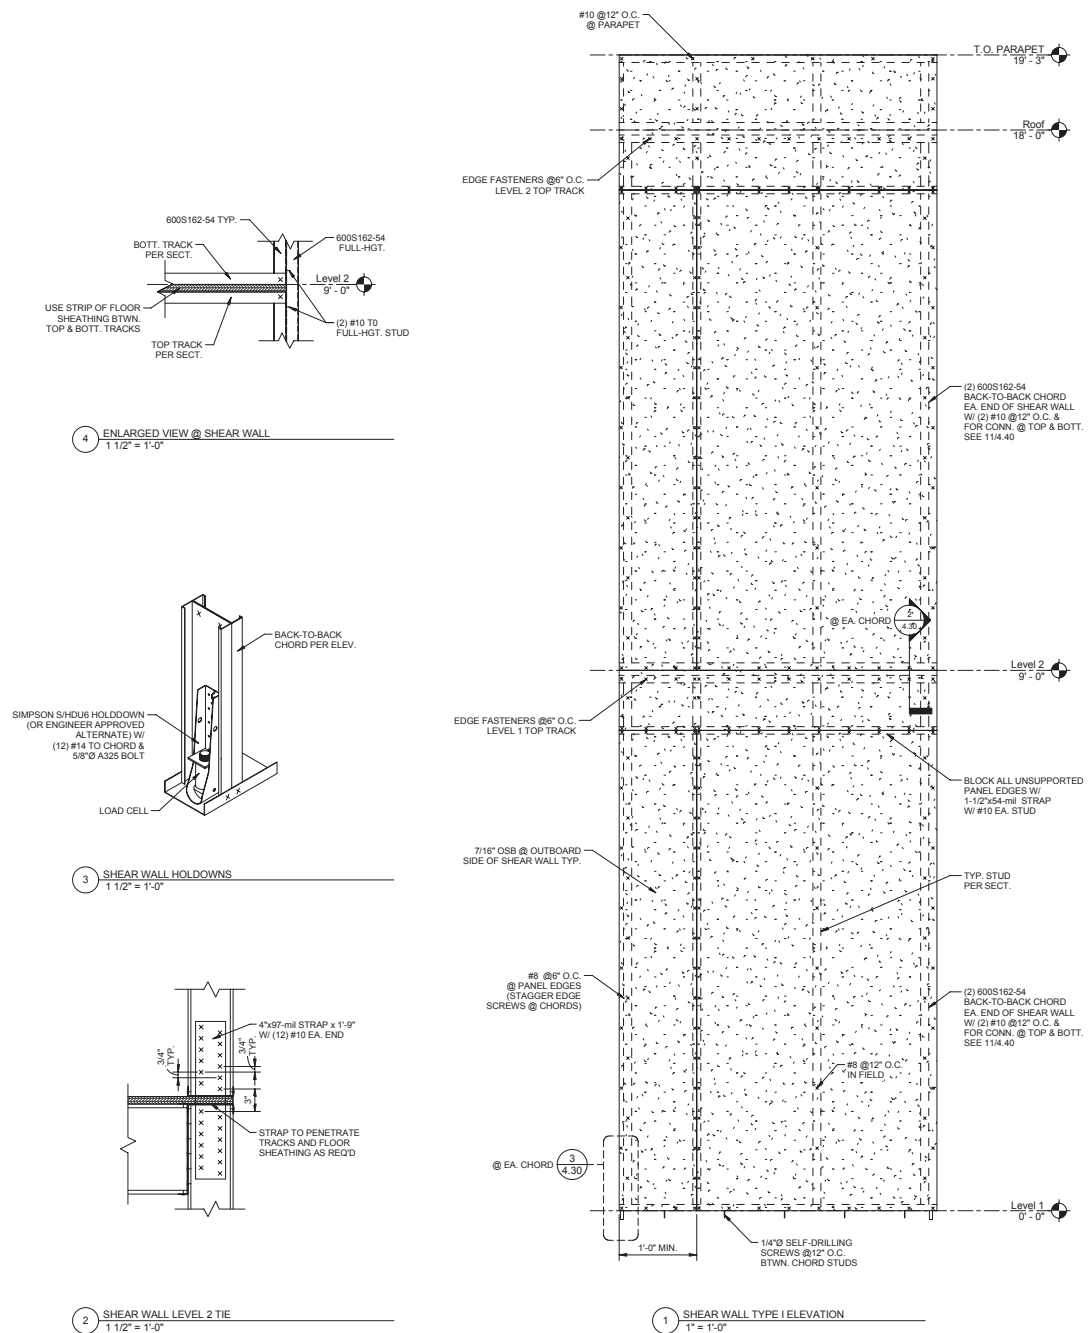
Typical shear wall framing for the Phase 1 building (chord stud fasteners are drawn staggered at 12 in. (30.48 cm) on-center but were construction in line, on the outer stud, at 6 in. (15.24 cm) on-center).
